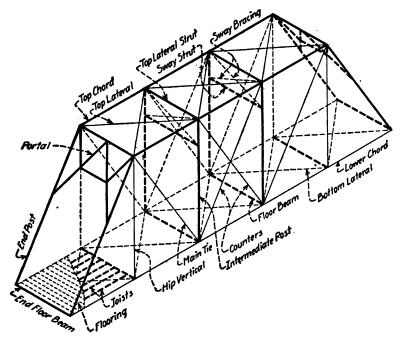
Diagrammatic Sketch of a Through Pratt Truss Highway Bridge.
